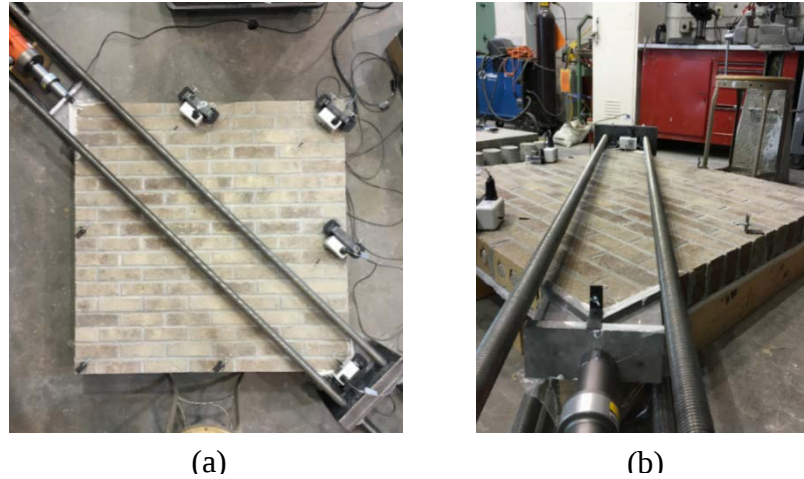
Loading apparatus from (a) a profile view, and (b) looking on the plane of loading
